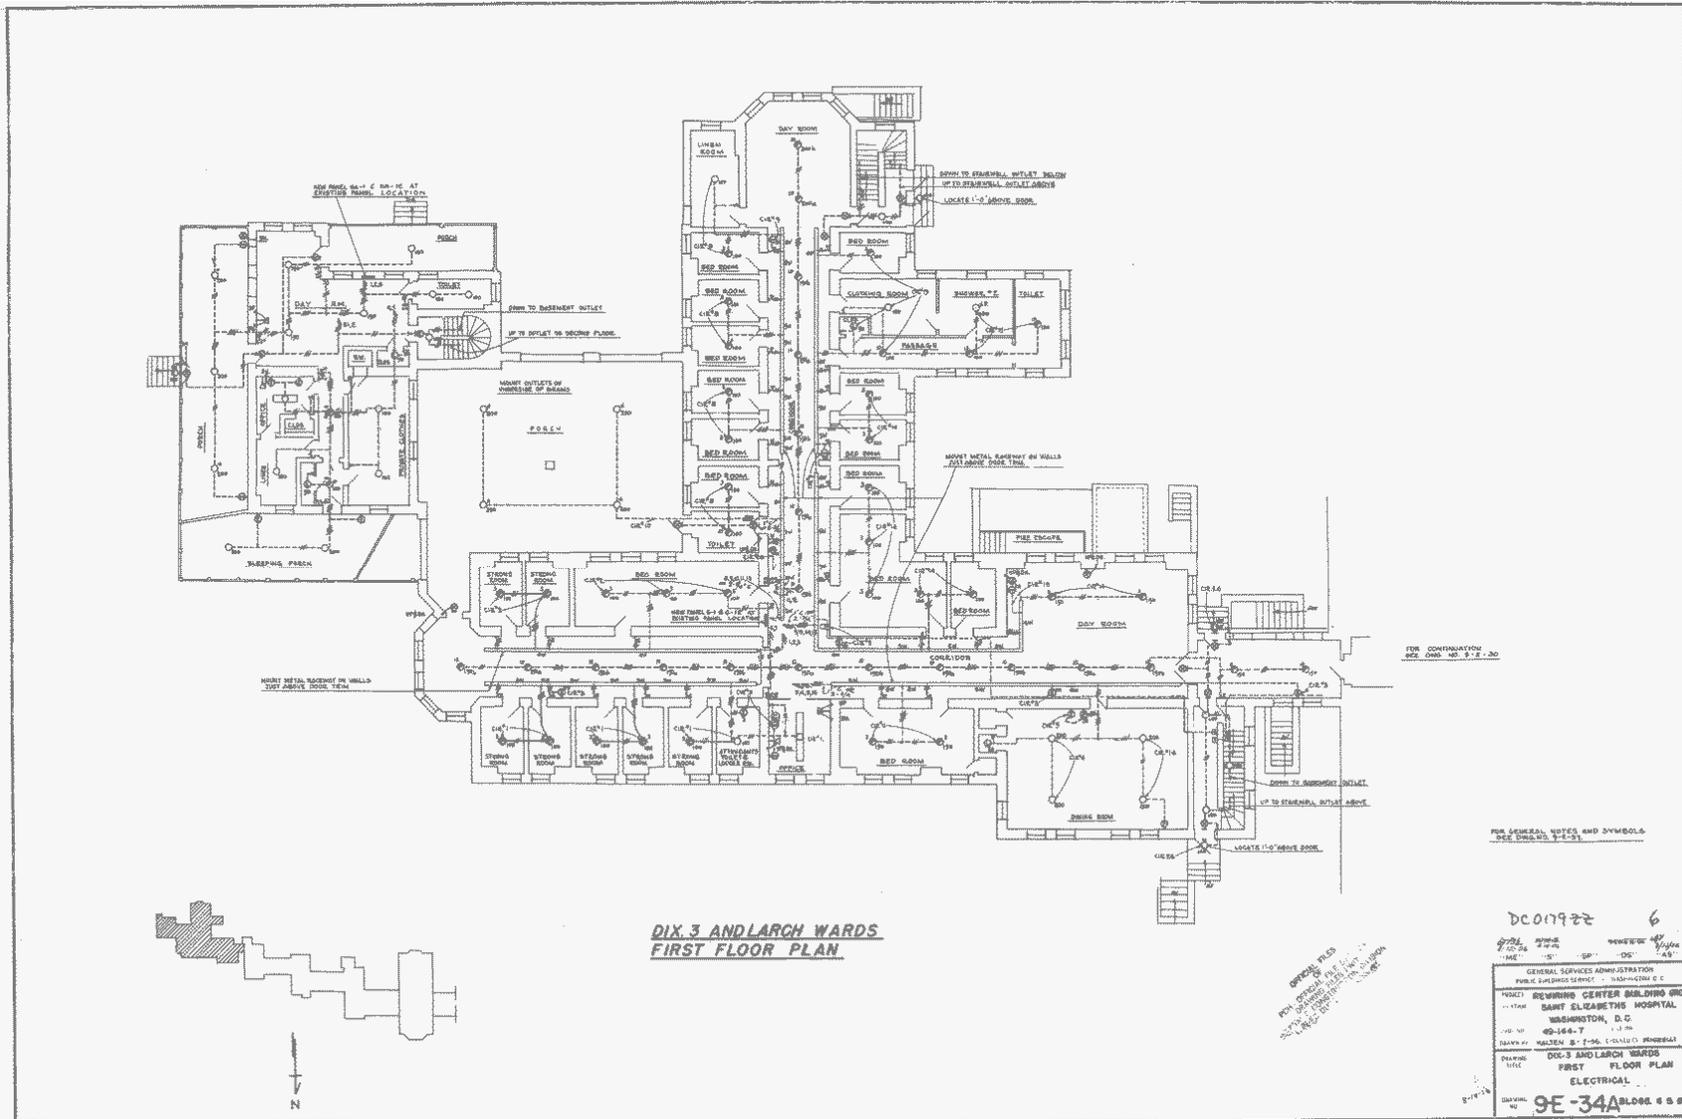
First floor plan of Pine showing electrical improvements, 1956. Source: GSA Archives, image DC0179SE0006.
